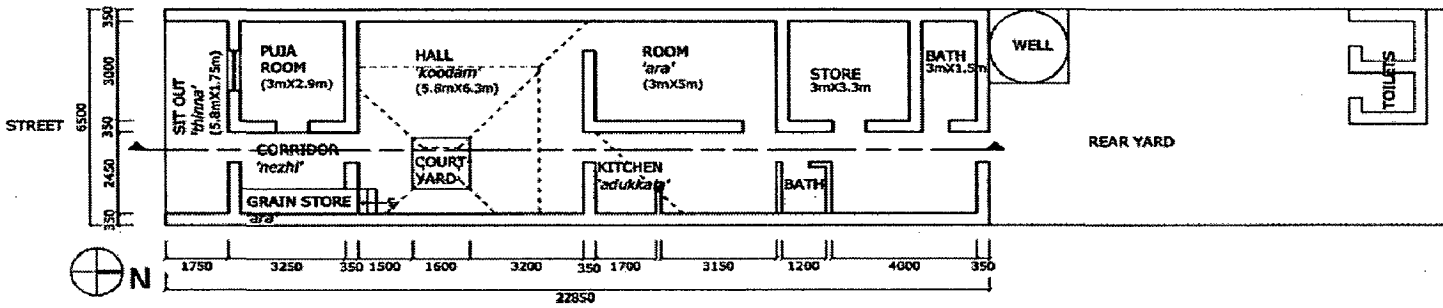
Ground floor plan of residence 1, in Vadakkencherry agraharam
